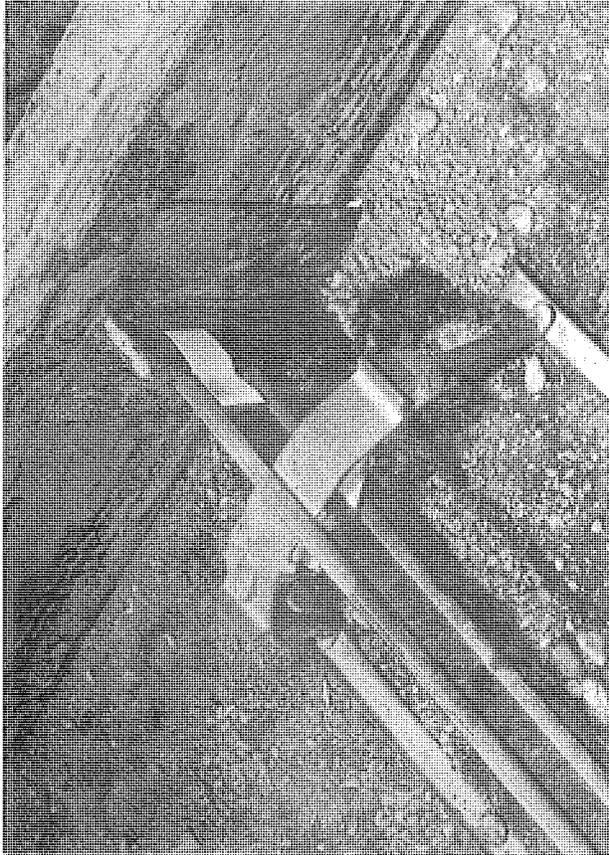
Steel plate for forming edge groove attached to Acme assembly center plate.
